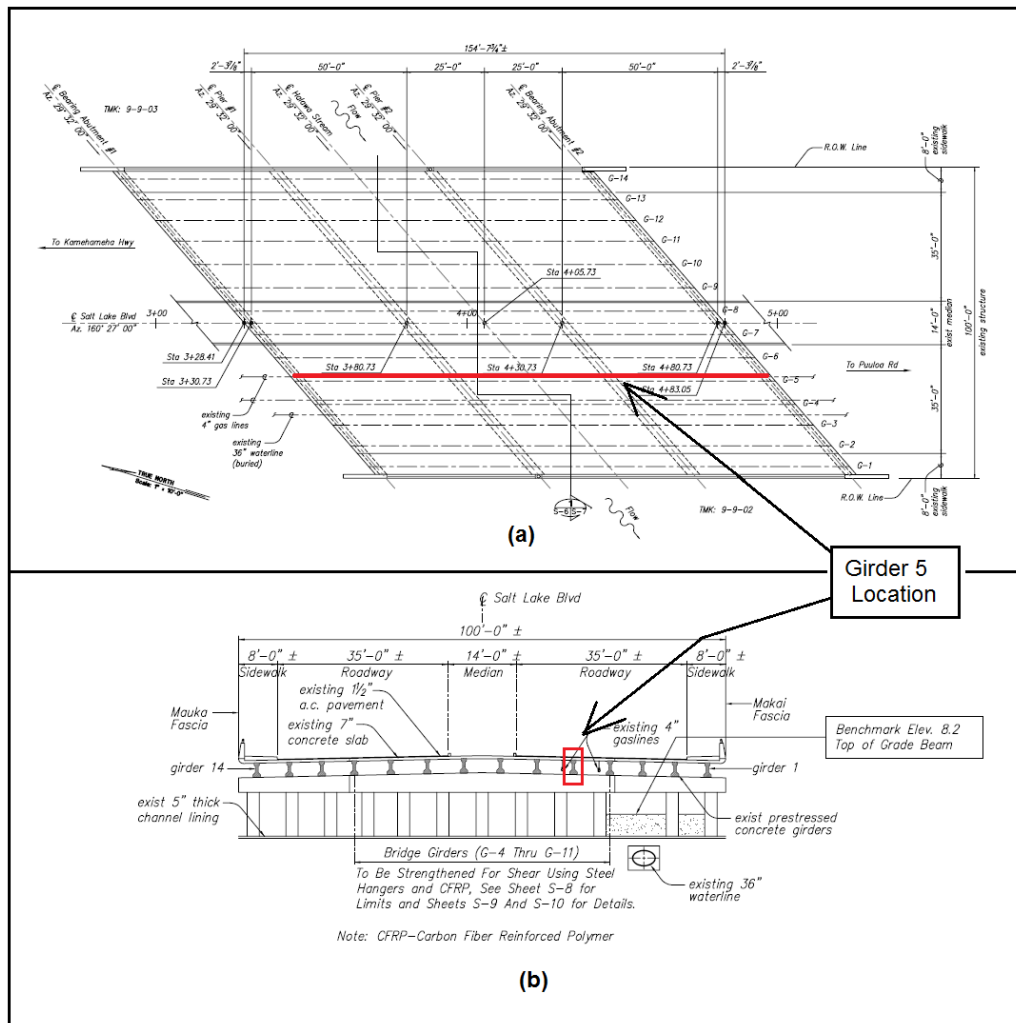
The location of the girder instrumented with FBG sensors in (a) the plan view and (b) the cross section of the construction drawings.
